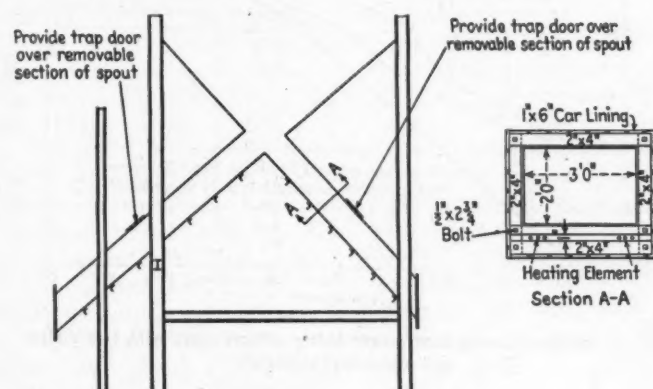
Heating cable, installation in a chute enclosed in car lining
